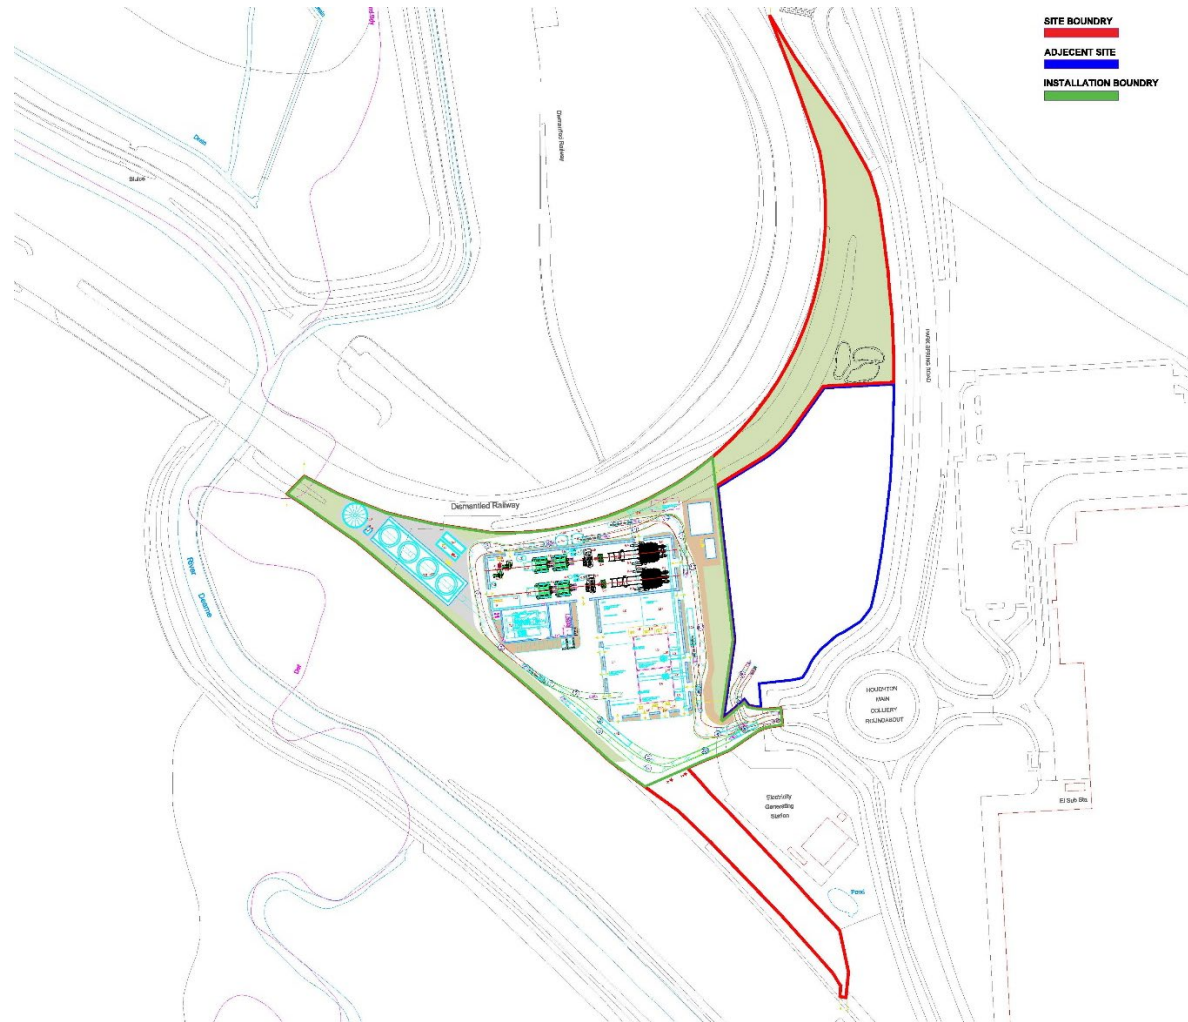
Installation Boundary and Site Layout (labelled version shown in Annex A – Site Plans)
